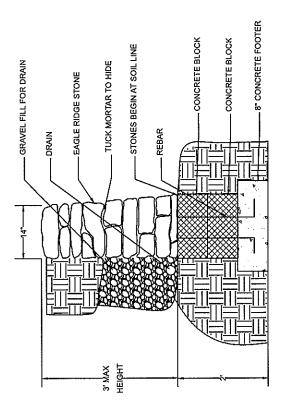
IMAGE OF DRY PACK EAGLE RIDGE STONE WALL (Image provided by Wayne Lampe, Stone Solutions)
